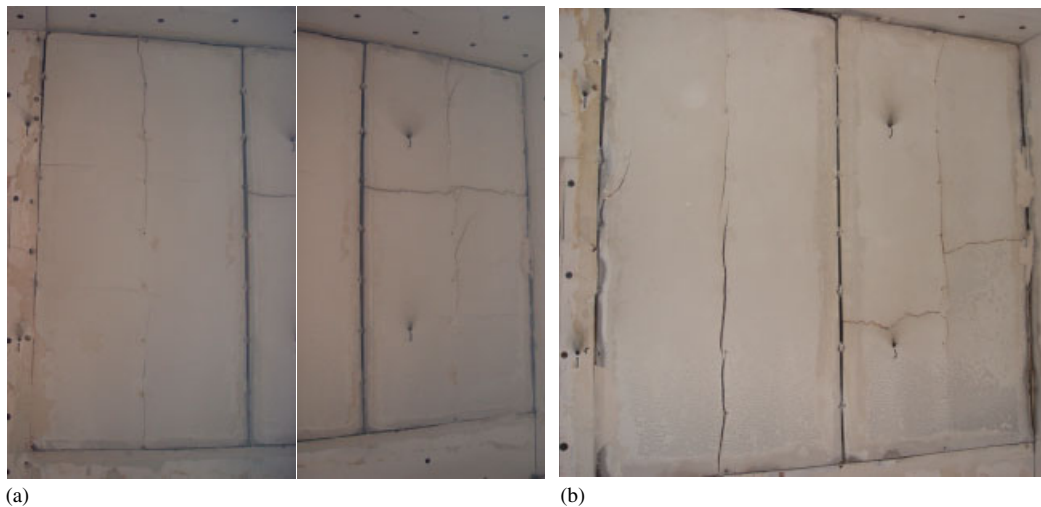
(a) Digital pictures of the exposed face immediately after the fire exposure for Assembly One; and (b) digital pictures of the exposed face immediately after the fire exposure for Assembly Two.
